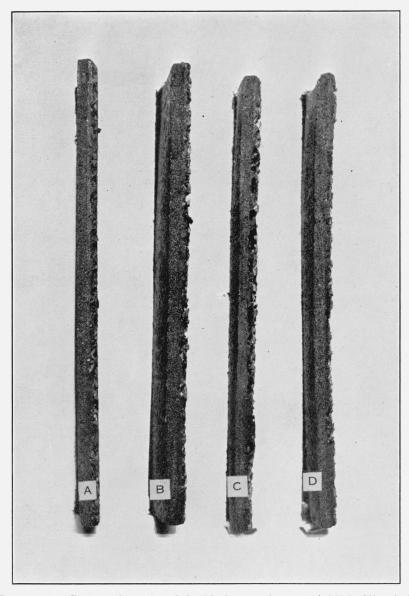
Cross sections of asphalt shingle test pieces $\times 1\frac{1}{2}$ (slight blistering).
